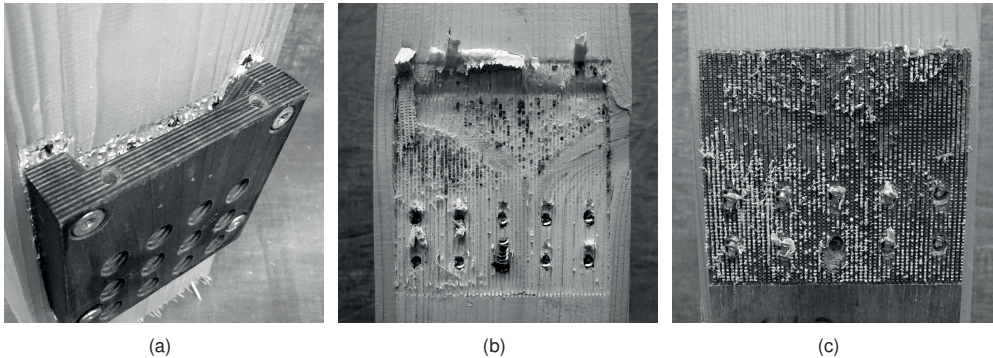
Connections after test: (a) impression of connector v2; (b) close-up of shear plane; (c) close-up of modified surface.
